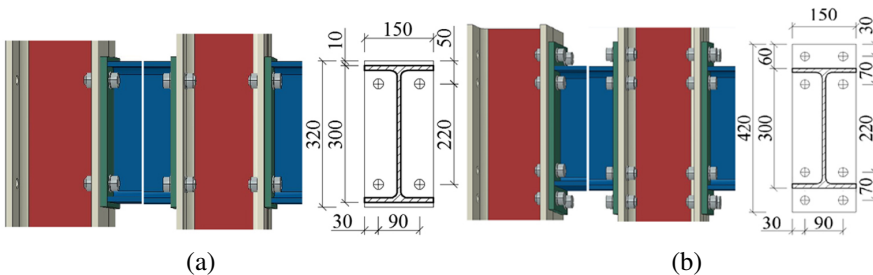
View of bolted end-plate joints: (a) flush, (b) extended
